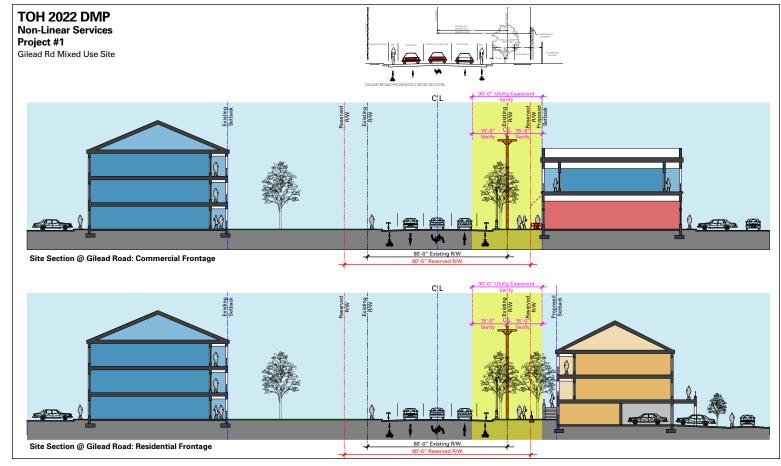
Gilead Road Mixed-Use Project - Huntersville, NC: Conceptual Site Sections at Gilead Road.
